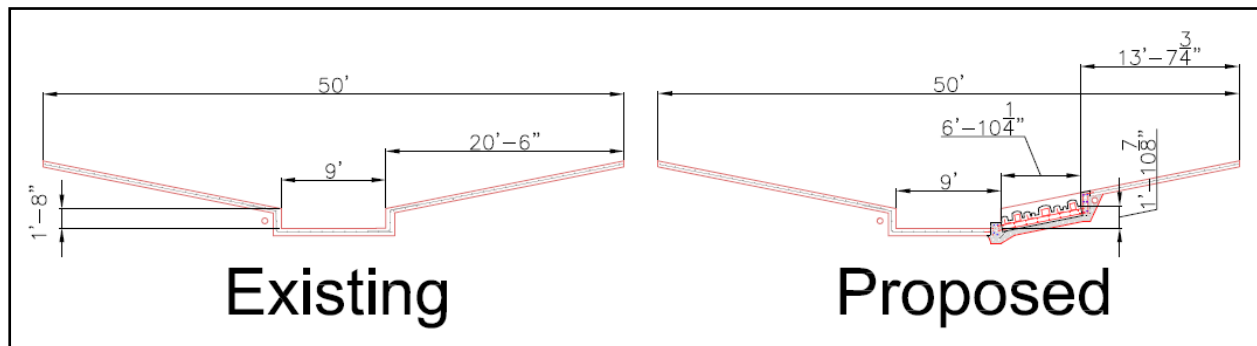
Existing and Proposed Cross Sections of Concrete Flume in Proposed Project Area (Reach Type 3).
